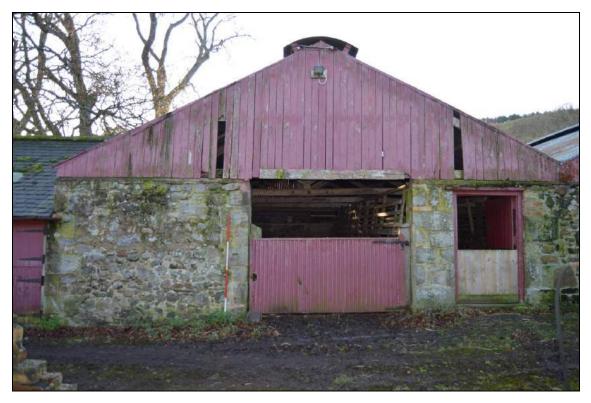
North elevation of south animal shed, east gable (facing south). Scale 2m.
